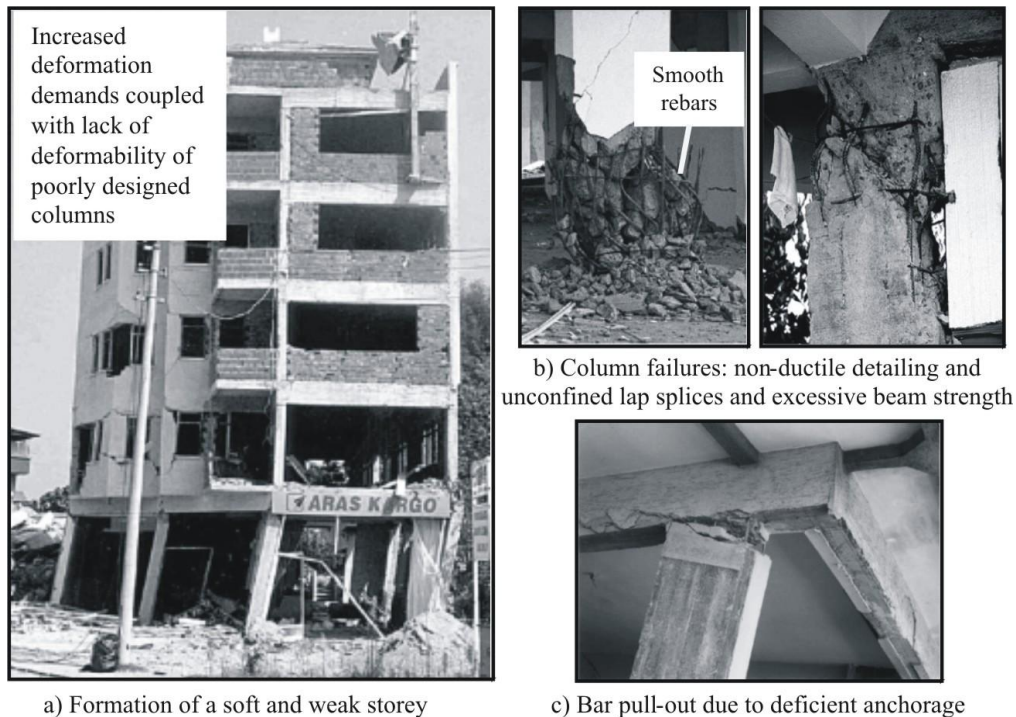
A view of collapsed RC building and close-up of the damage to moment frame elements [15]
